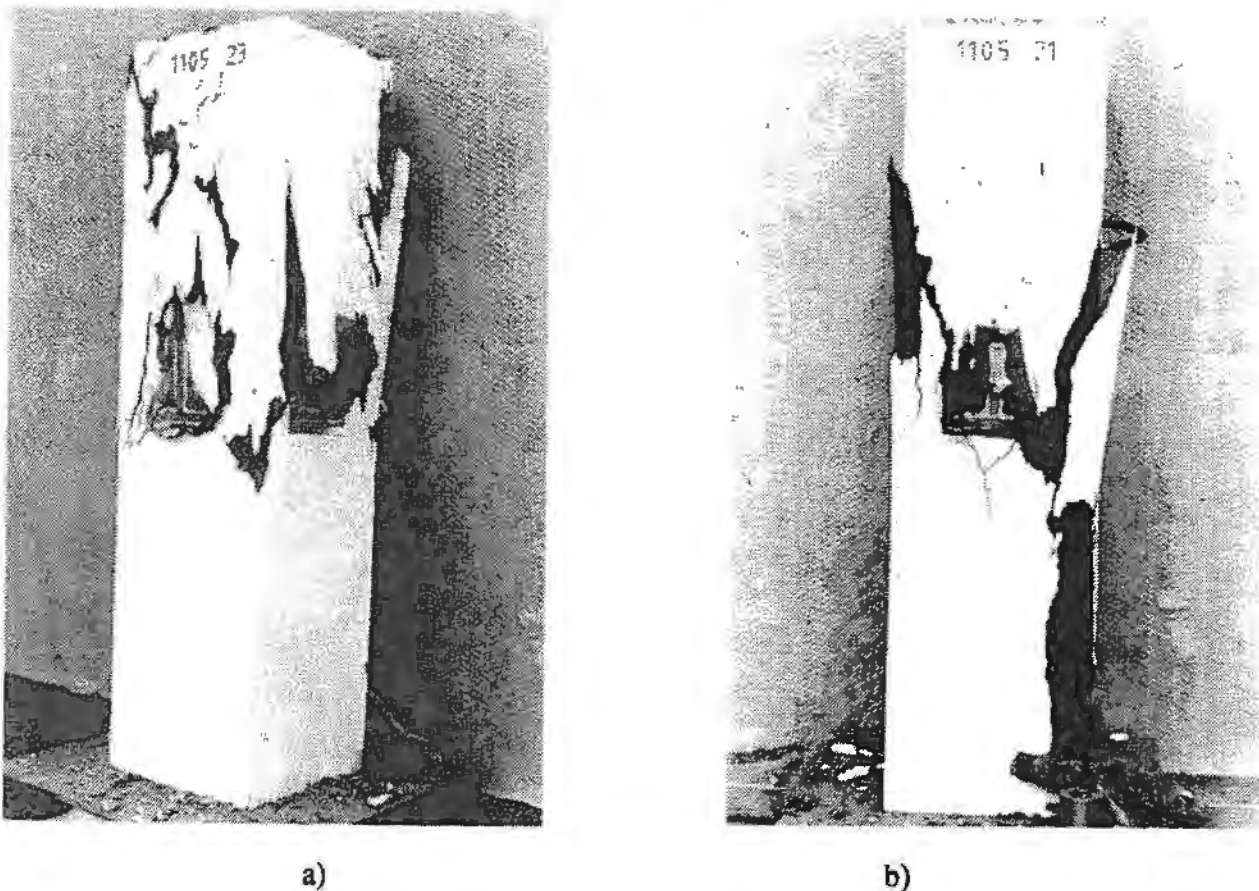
The photos show the failure of a) normal strength concrete (#5) and b) high strength concrete (#17) stub columns.
